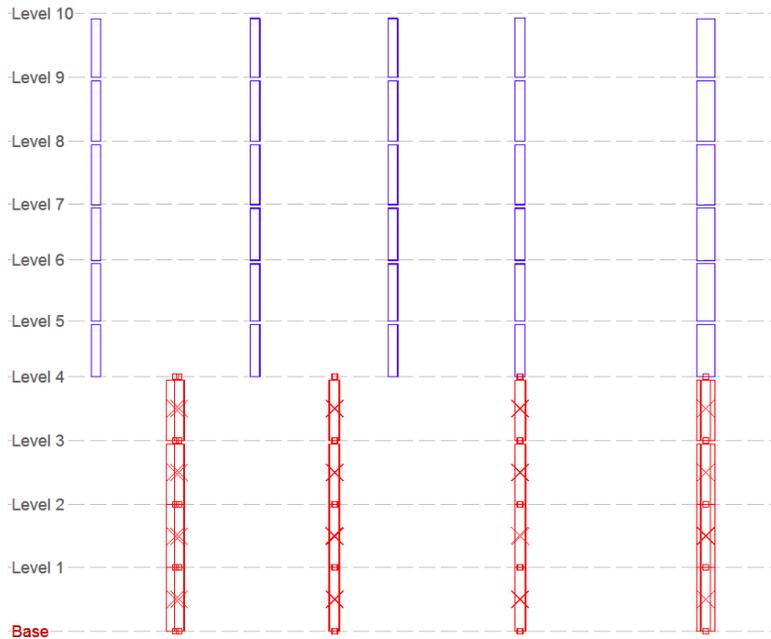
Columns-only Elevation View with Lower Levels Selected
